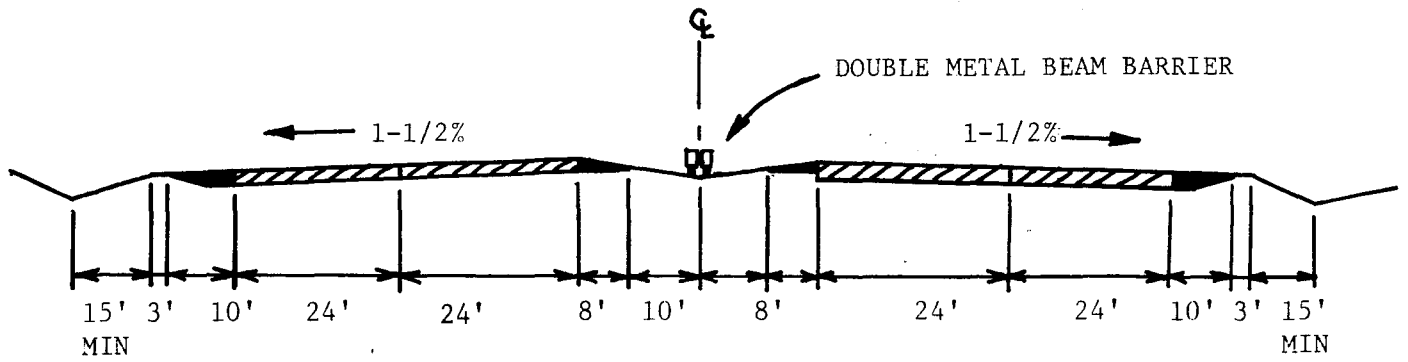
Typical cross section - Sacramento Hwy 50 site.
